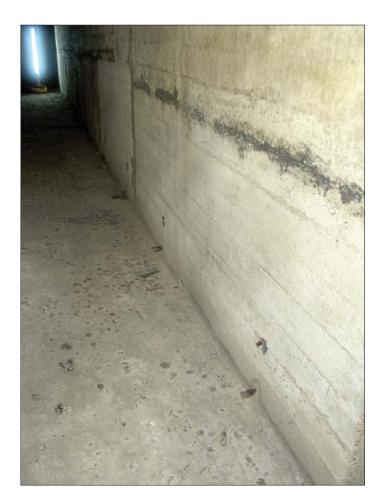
Studs along west wall of Tr 2b, former bench supports. Looking south-west.
